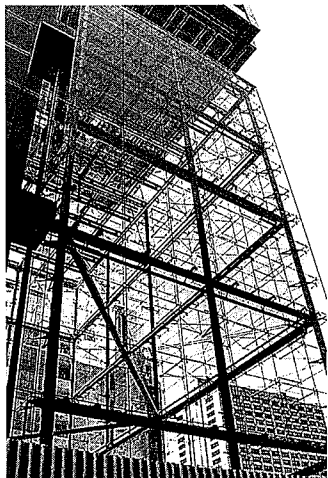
Atrium of head office building of Long-Term Credit Bank of Japan
